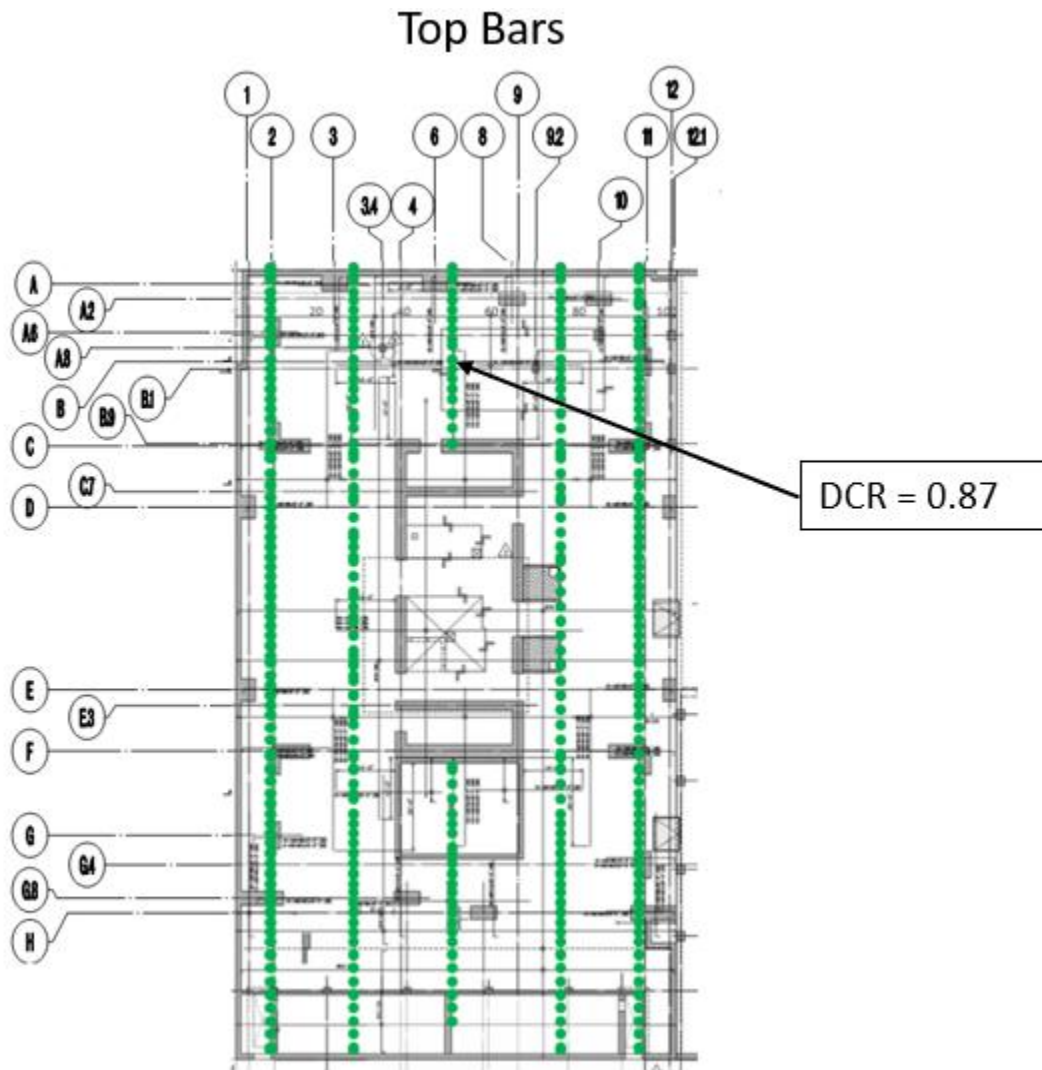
DCR Plot for North - South Top Reinforcement Design Strips for Gravity Load Envelope Existing Condition
